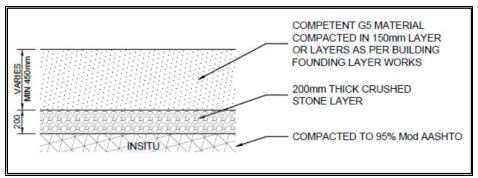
Excavation for road layerworks at depth (source: Walters, 2020)
